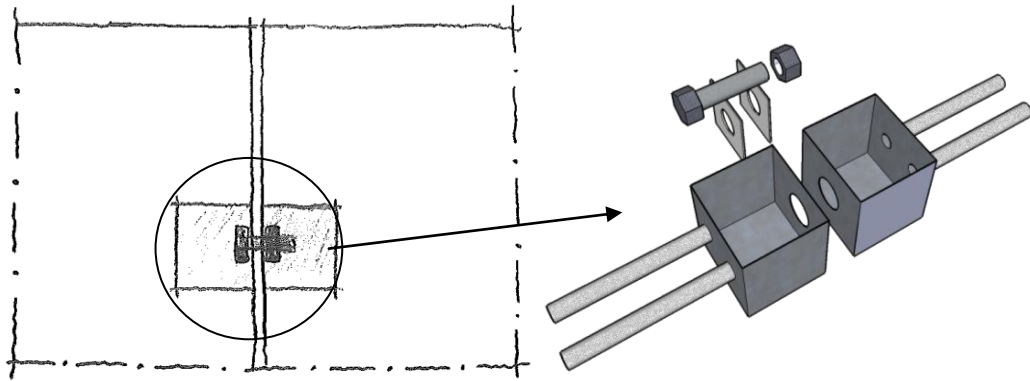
Sketch of floor-to-floor/ wall-to-wall connection. Visualised when cast in and the device only.
